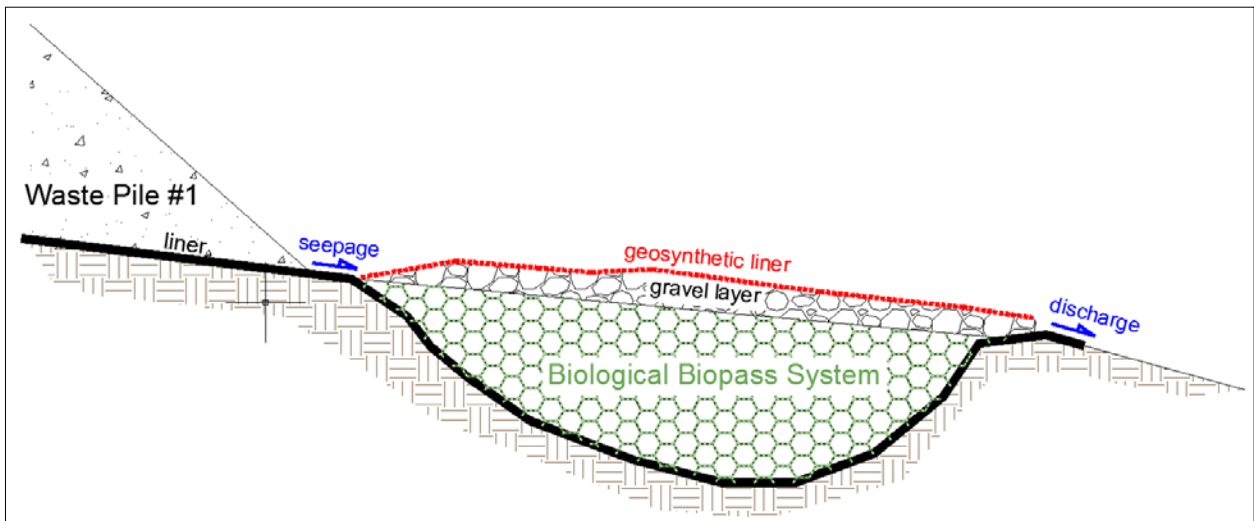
Proposed Waste Pile #1 Biopass System (not to scale)
